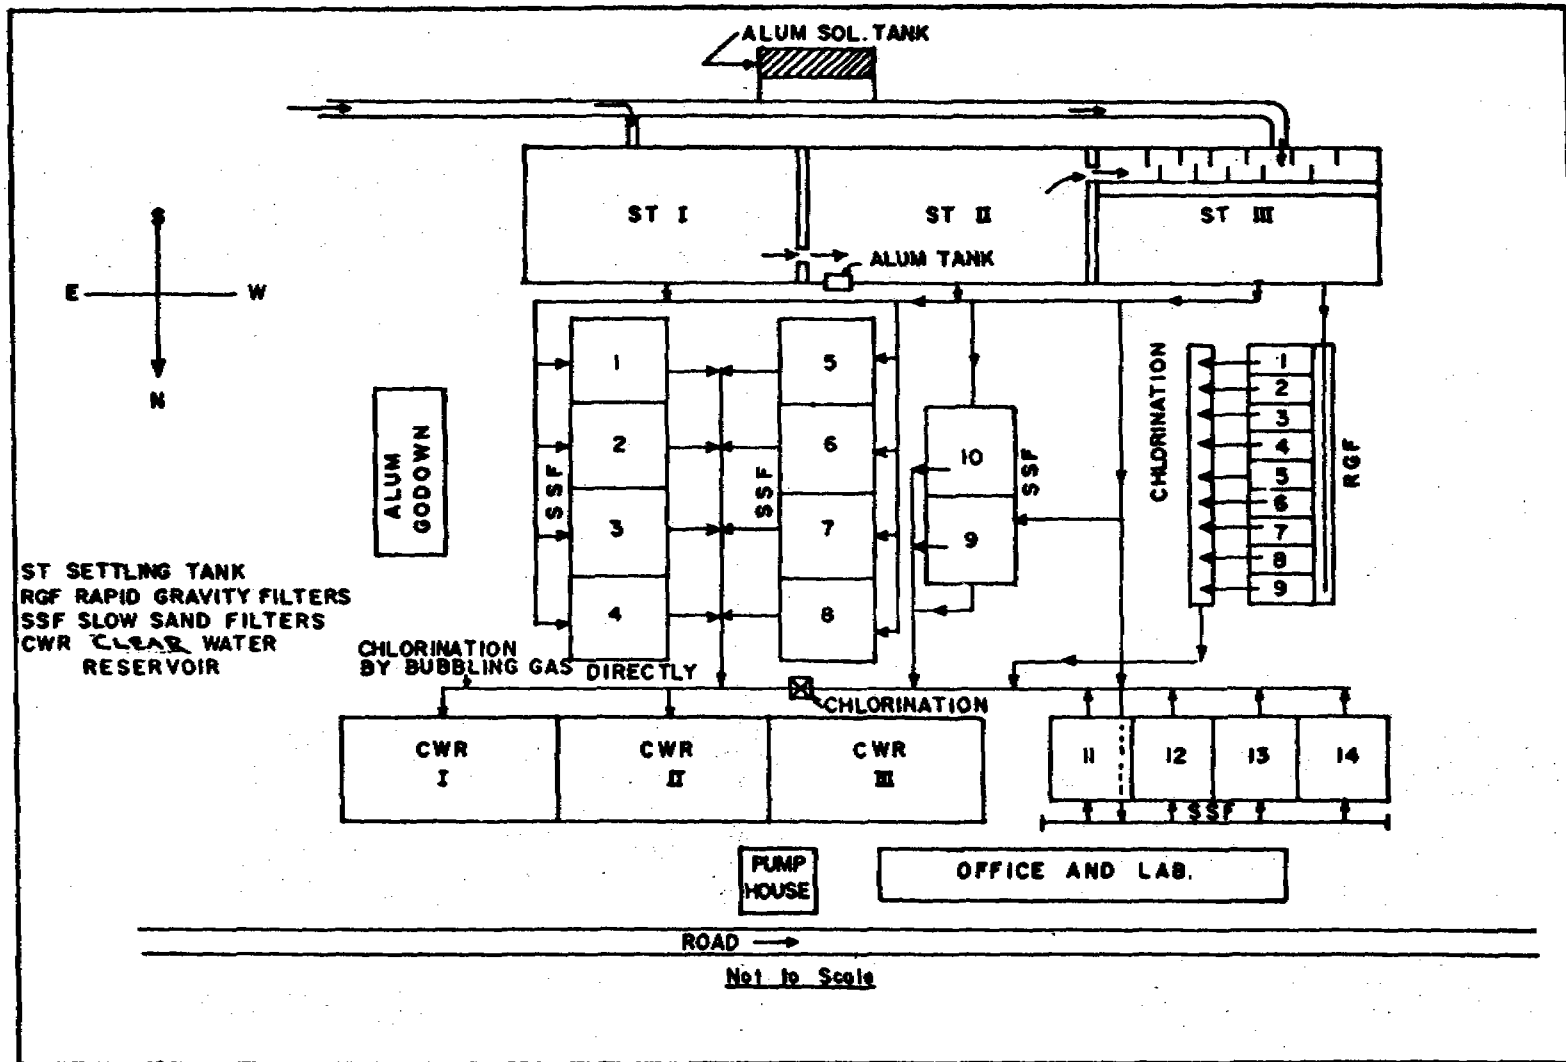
LAYOUT PLAN OF BHELPURA WATER WORKS, VARANASI
